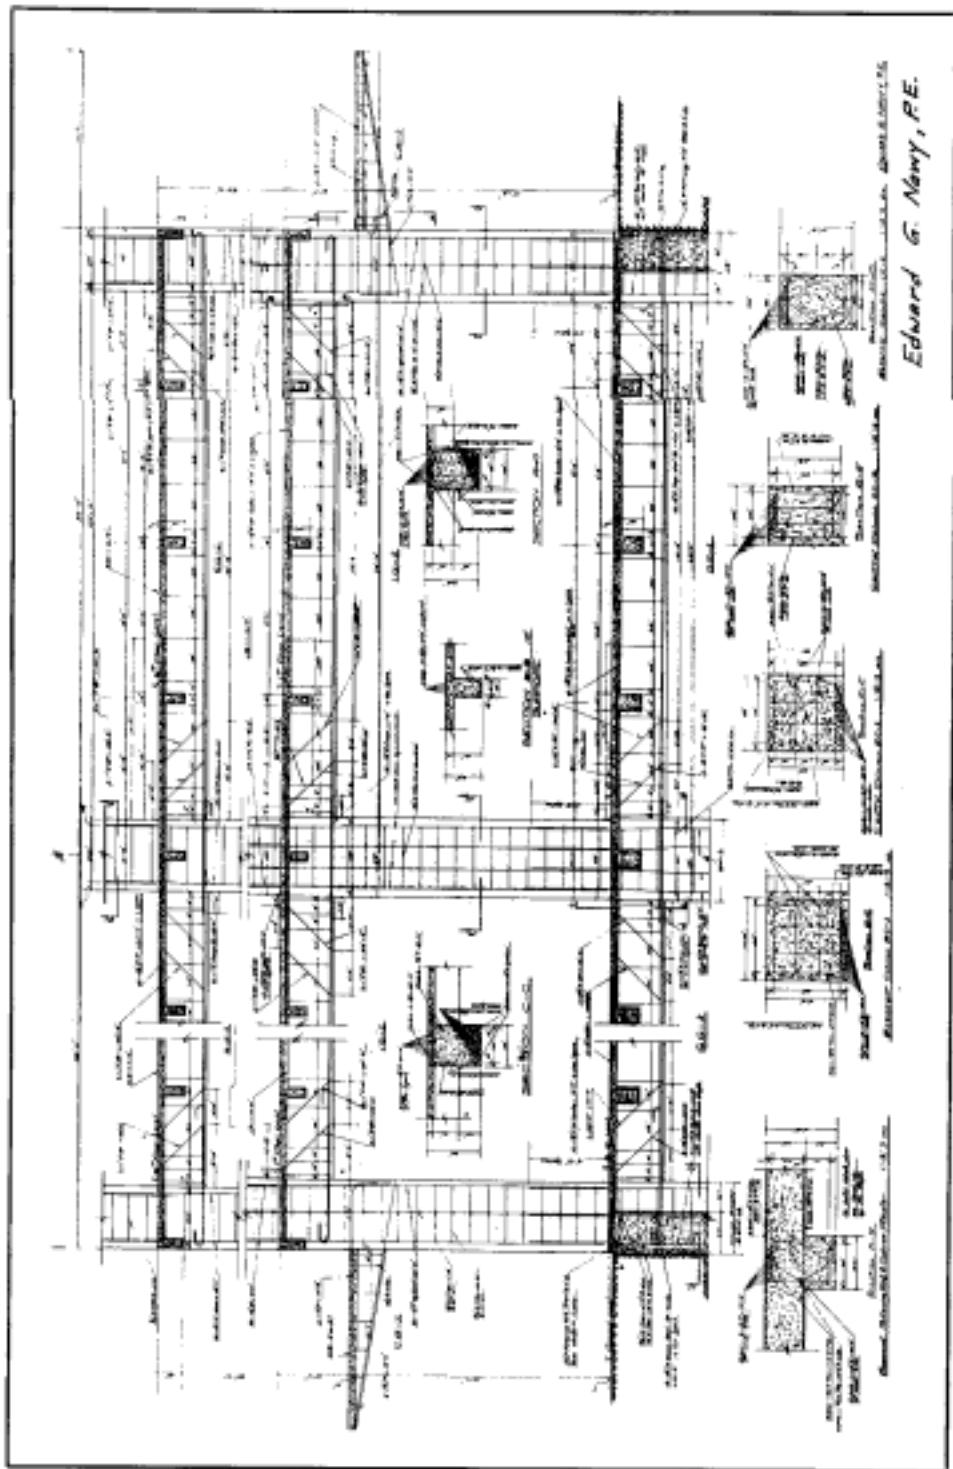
Typical working drawing of column reinforcement details. (Design by E. G. Nawy.)
